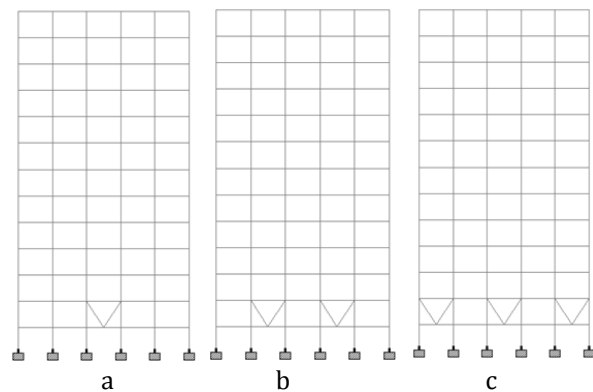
Optimum bracing pattern for 5-bay 12 storey structures, Ground floor level braced.
